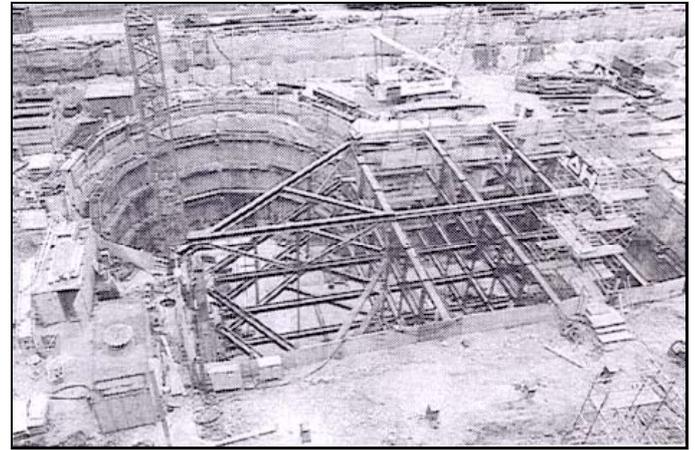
Underground construction of similar shape to IPS (after Katzenbach et al. 1998)
